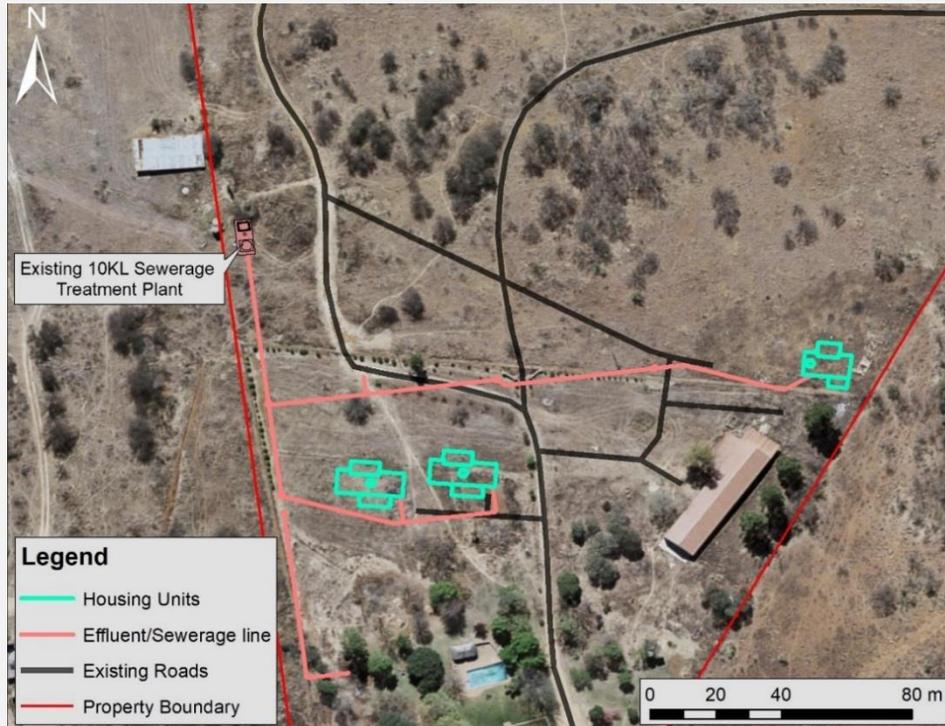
Effluent/Sewerage lines from new housing units to new 10kl sewerage treatment plant
